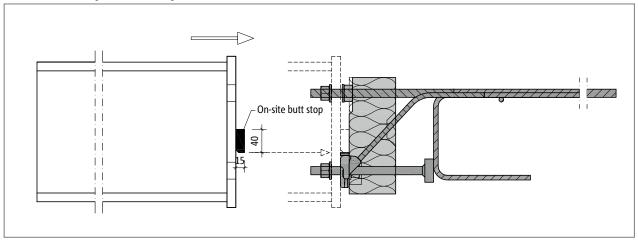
Schöck Isokorb® T type SK: Mounting the steel member
